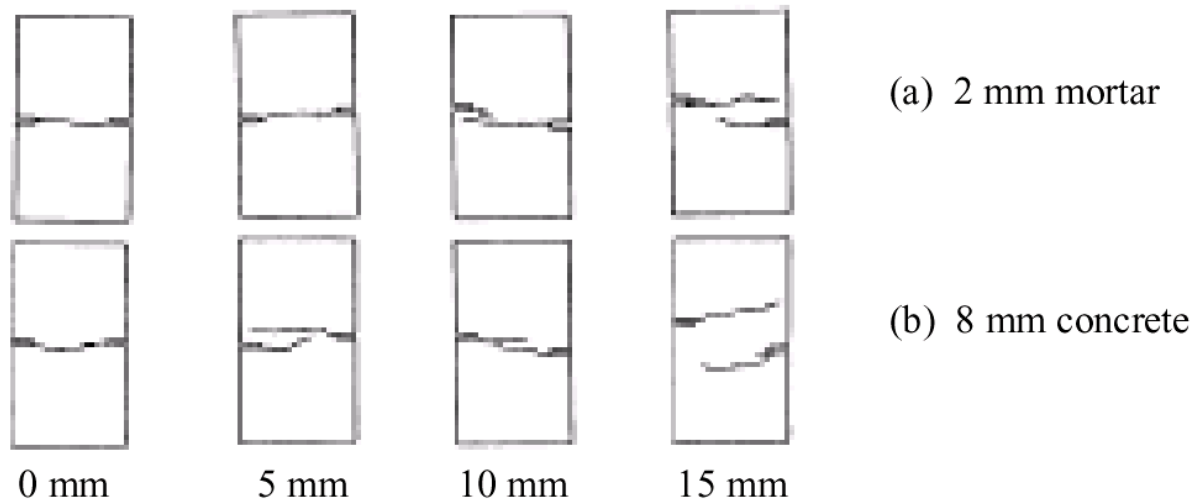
Typical final crack patterns of 2 mm mortar and 8 mm concrete
